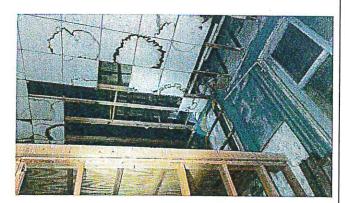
| Second Floor, West Exterior Wall at Center Beam Bearing.
